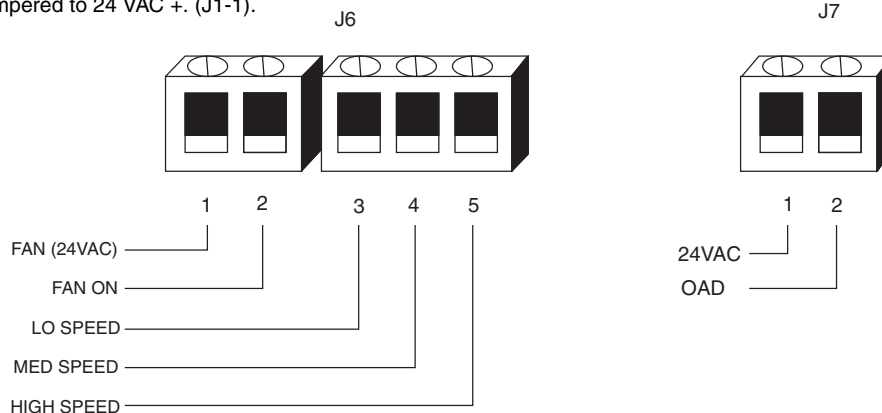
Fan Coil Controller Daughter Board Outputs
